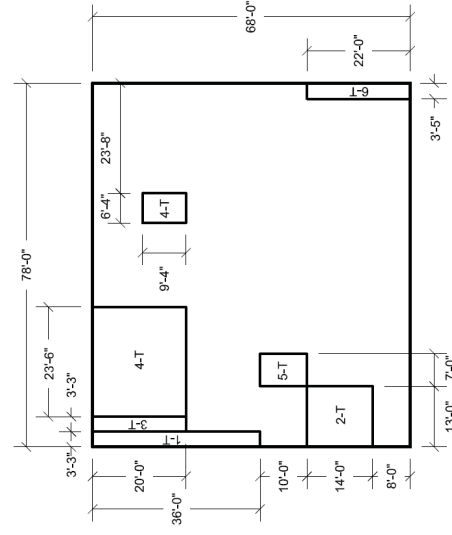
H-6-59: PUMP HOUSE EAST WALL LOOKING WEST
